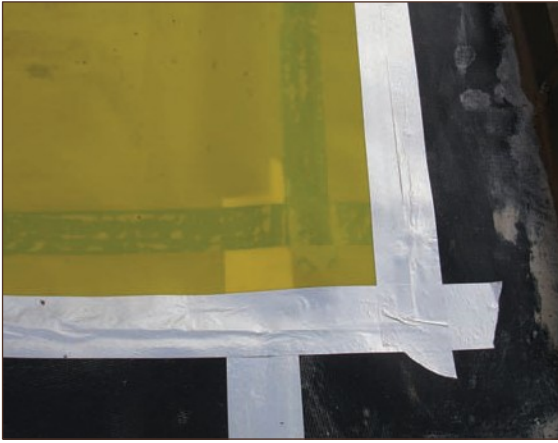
Well-constructed joints with gas resistant DPC, lap and double sided butyl joints visible beneath semi-transparent gas membrane, secondary seal with proprietary single sided tape (courtesy Smith Grant)
